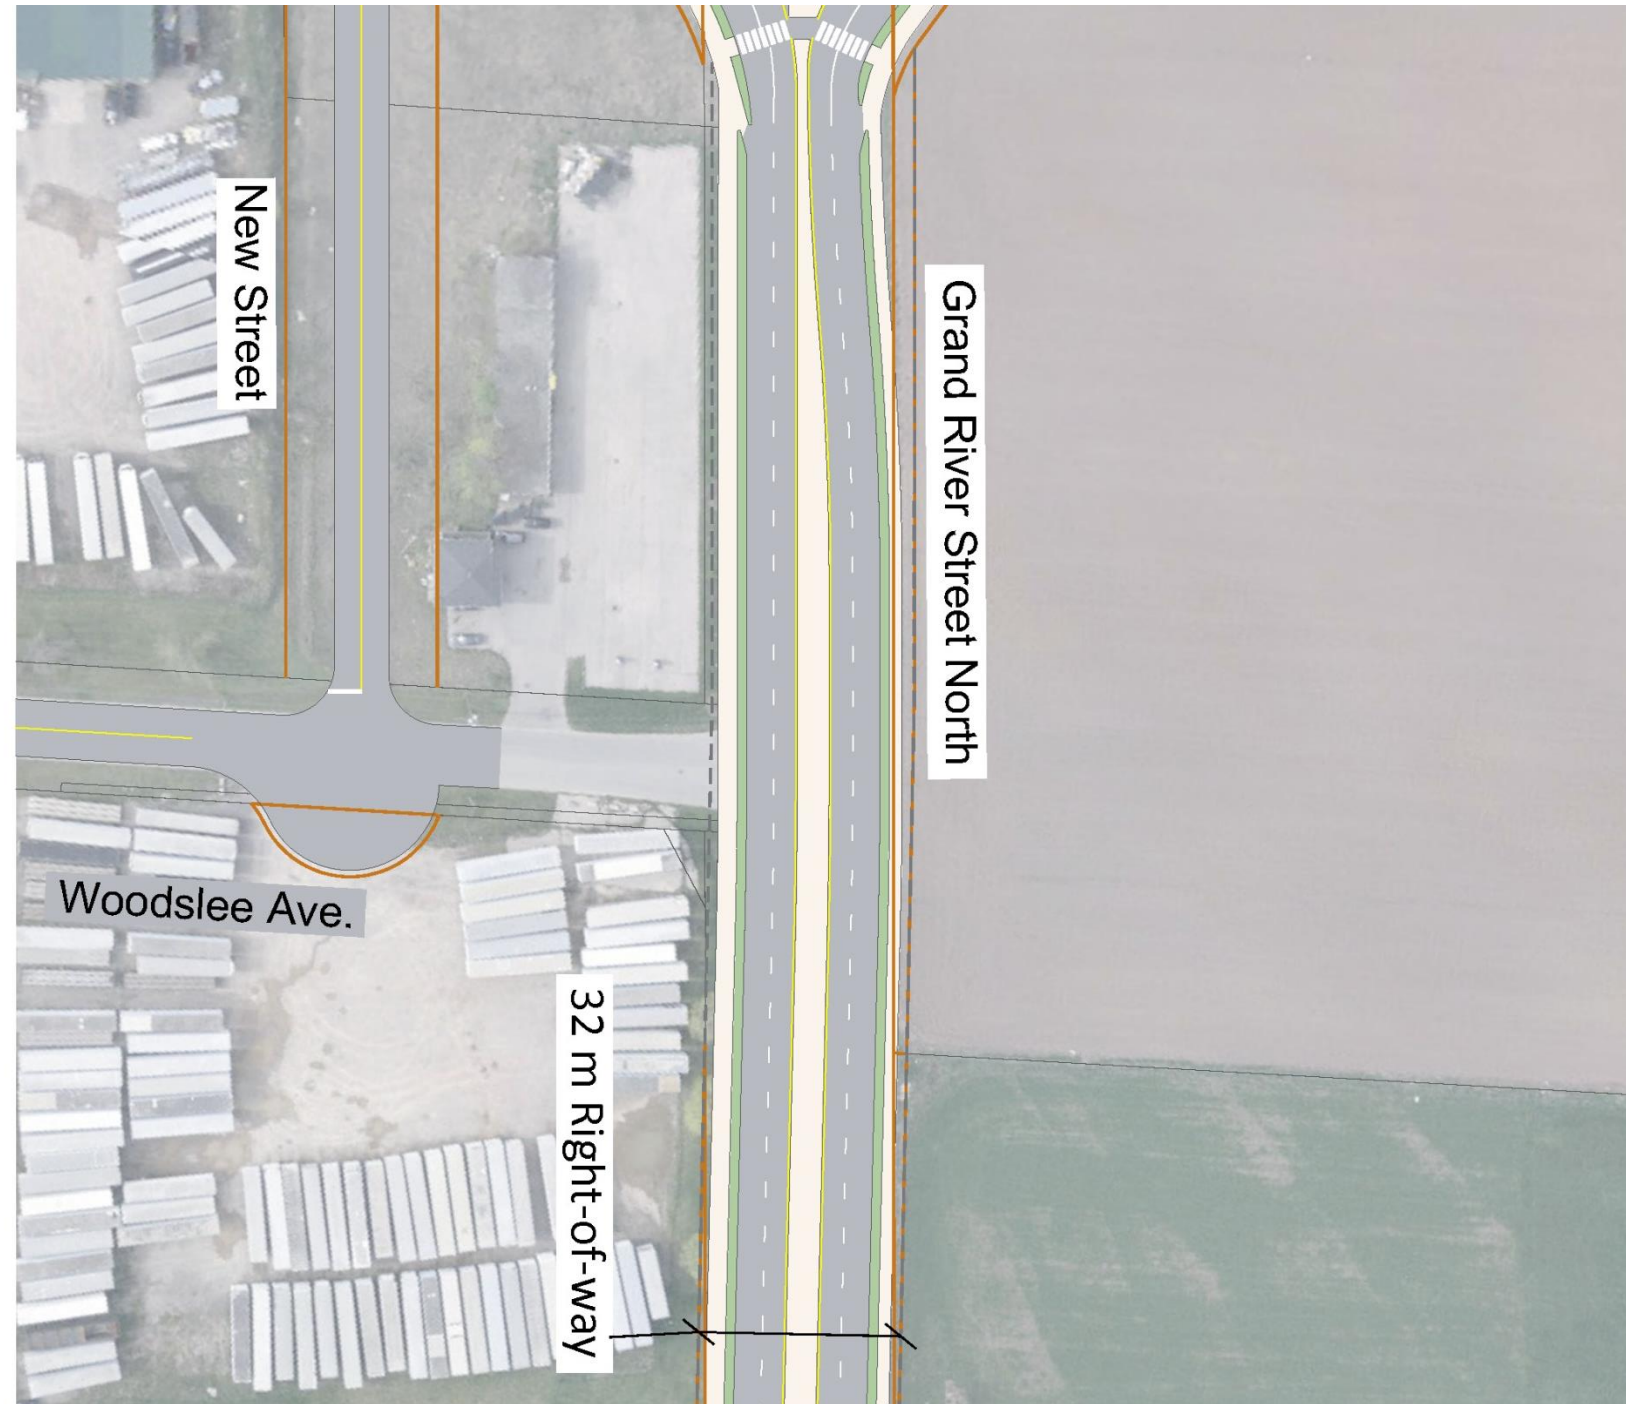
TPA Grand River Street North at Woodslee Avenue Intersection
